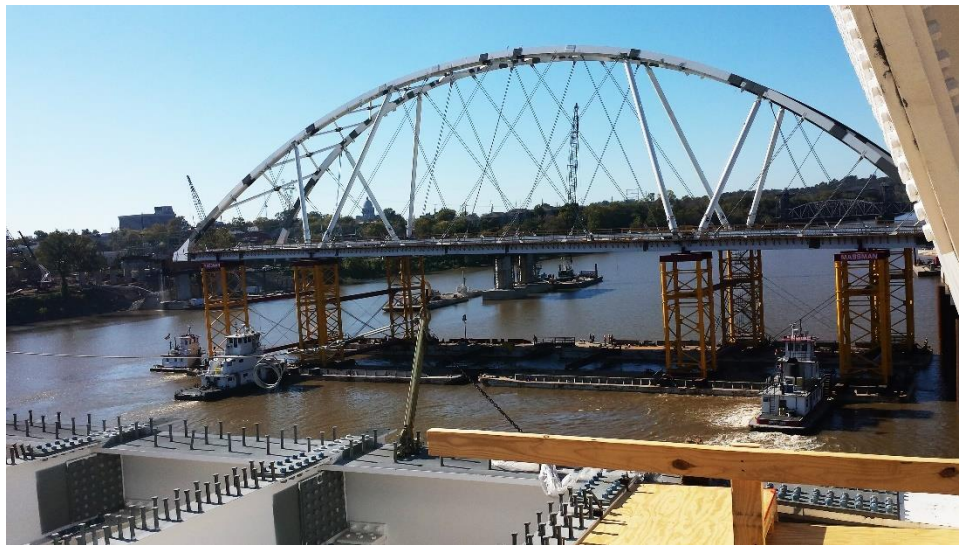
ARCH ERECTION ON FALSEWORK (HALSTED BRIDGE)
